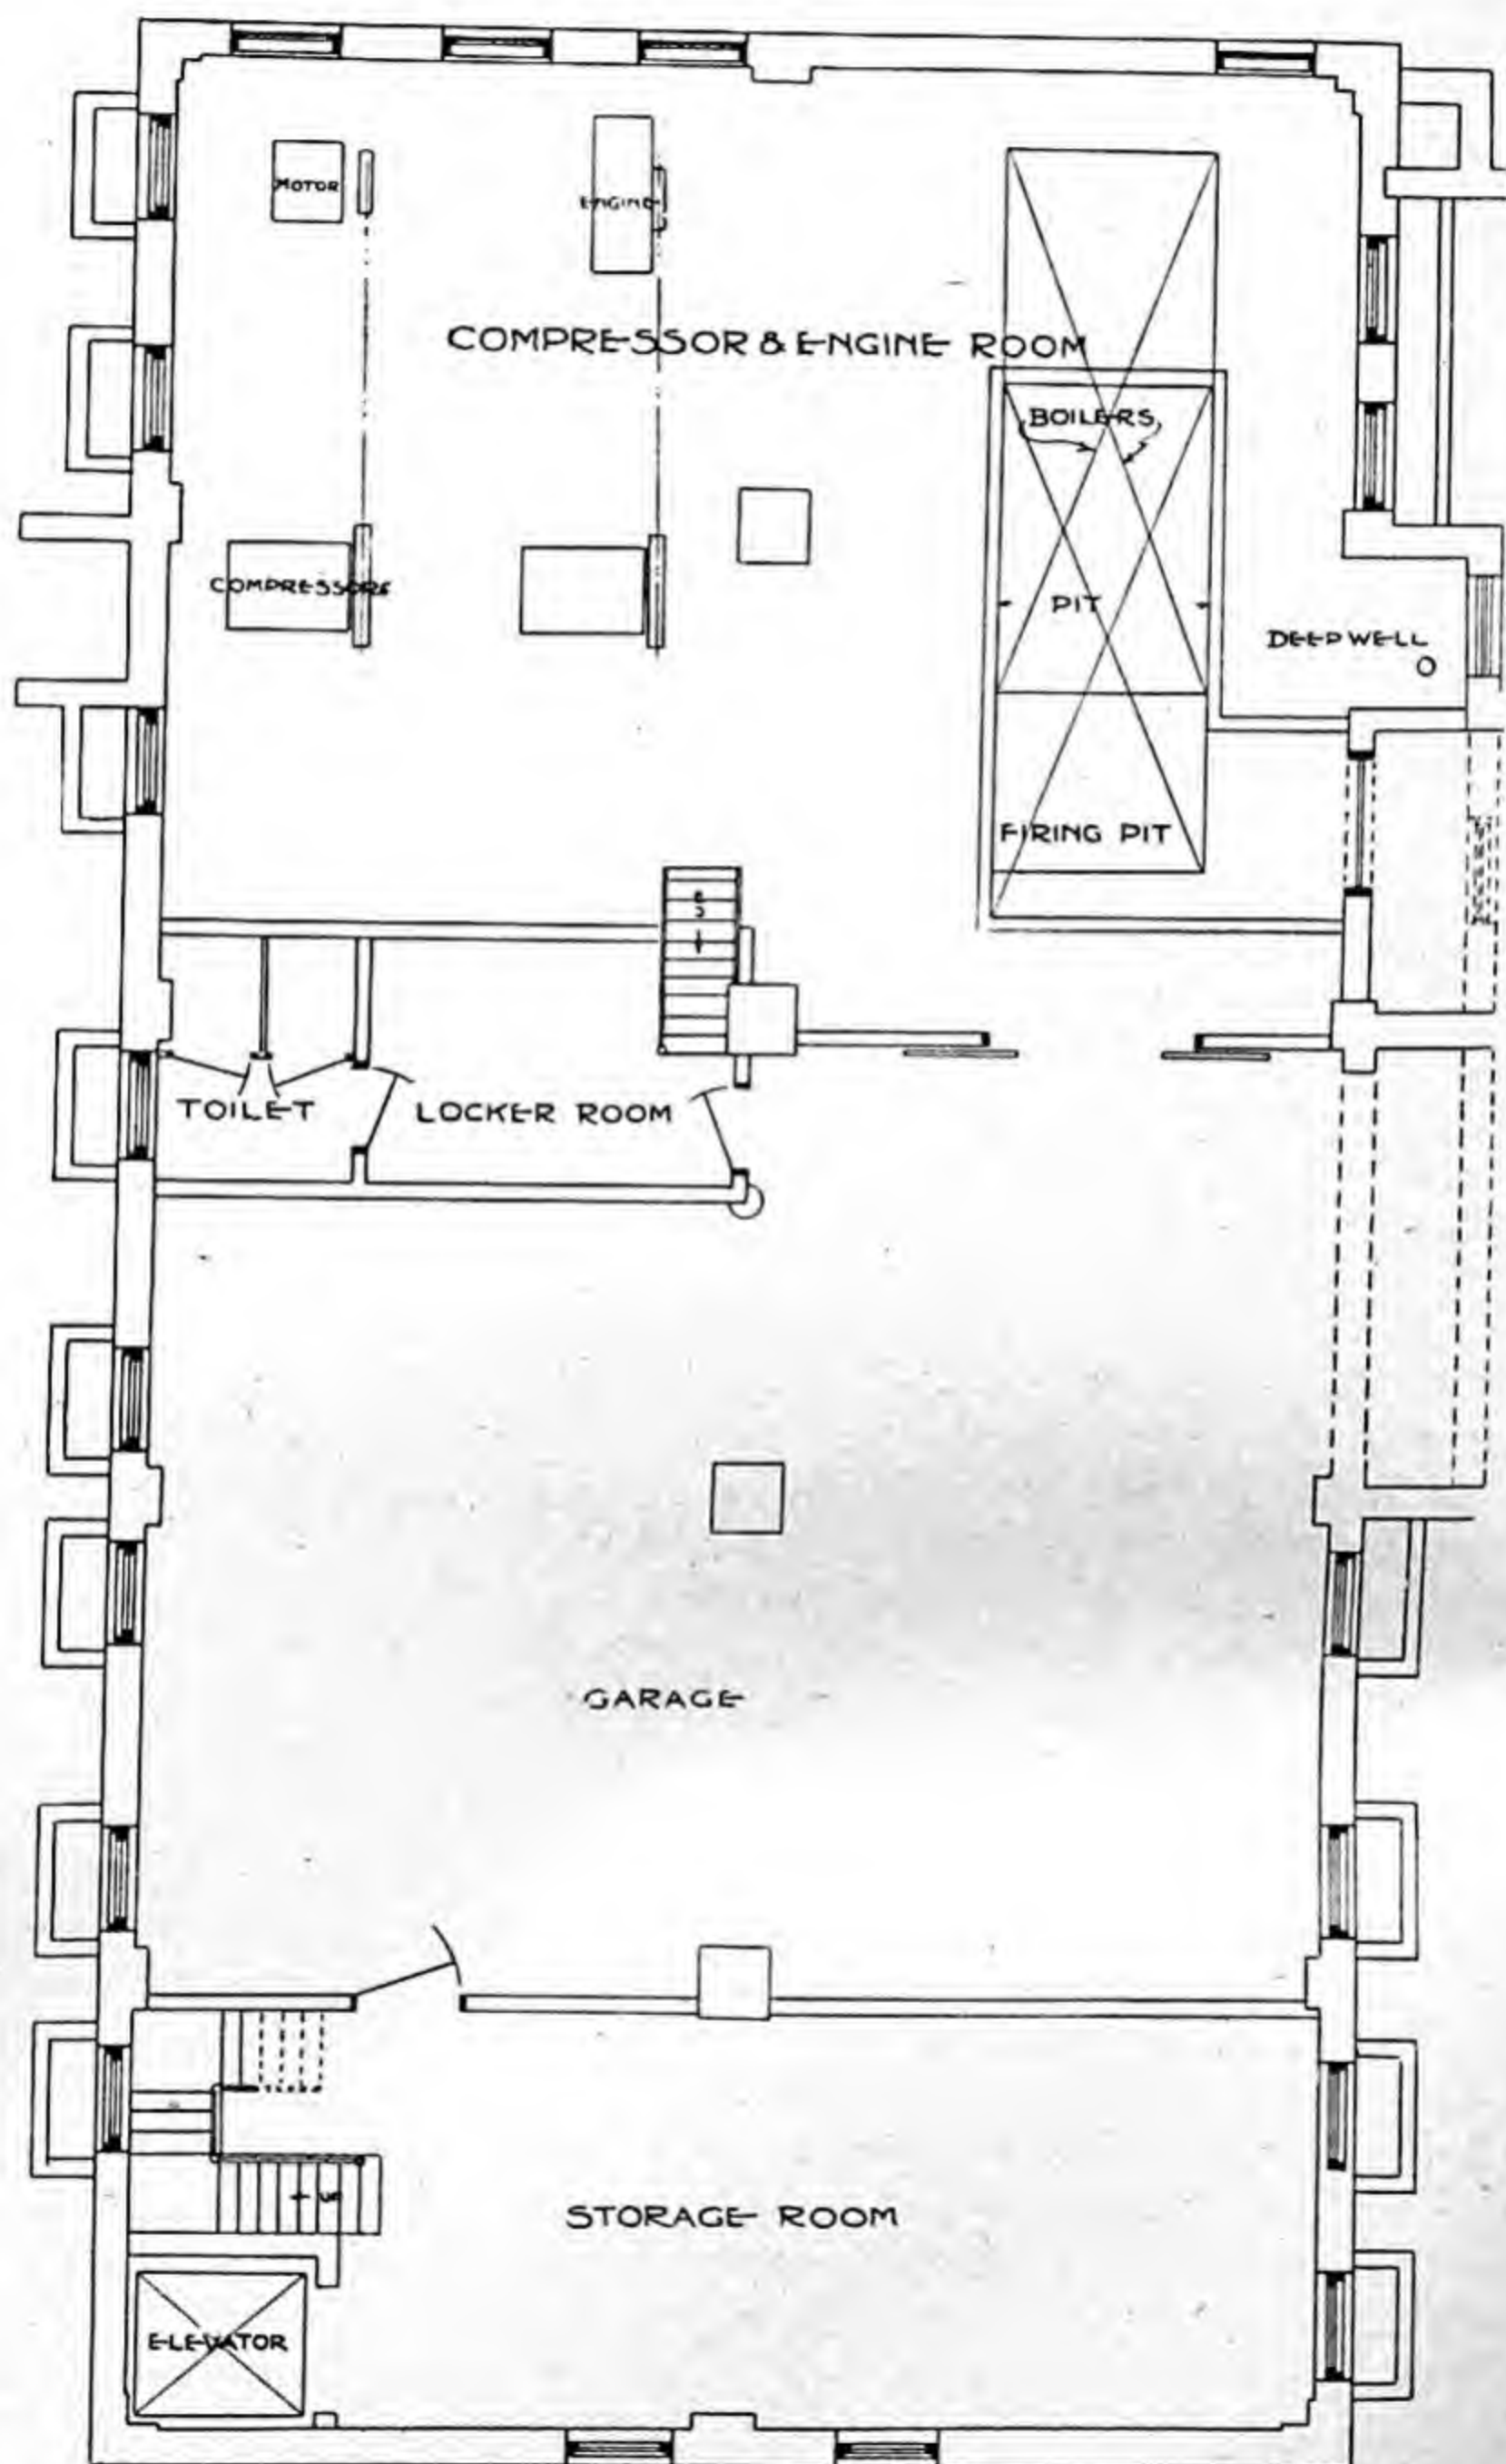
Basement Plan of Typical Creamery and Dairy Plant.
